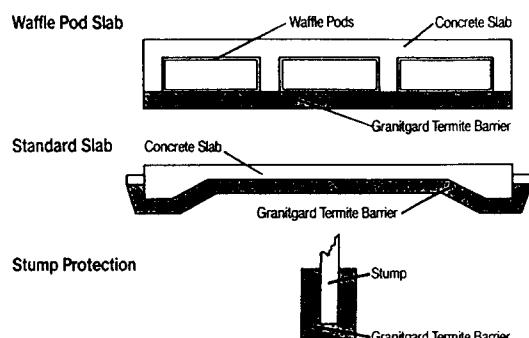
Termite barriers prevent termite access on ground construction (Waffle pod slab, Standard slab, Stump protection).
